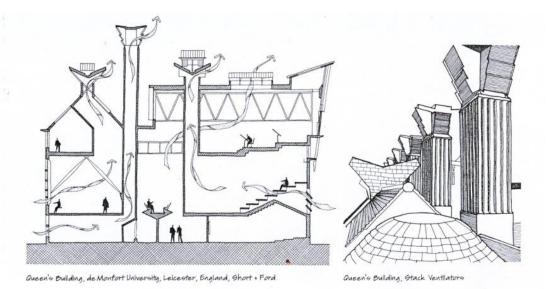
Use of chimney ventilation in Queens building, in engineering faculty of Demon for in England Source from: Wind & Light Brown.G.Z , Dekay. M, 2000, P 186
